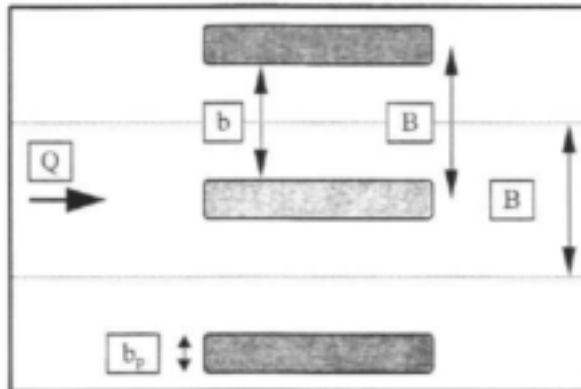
Typical pier lay-out, the flow is approaching from the left
